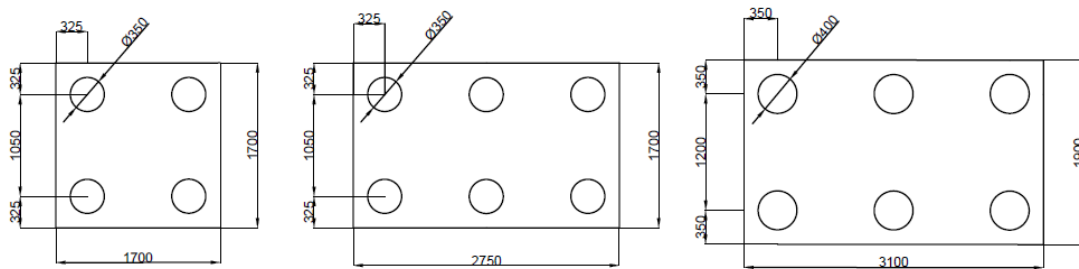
Group of Piles under 3 columns: Corner, Exterior, Interior
